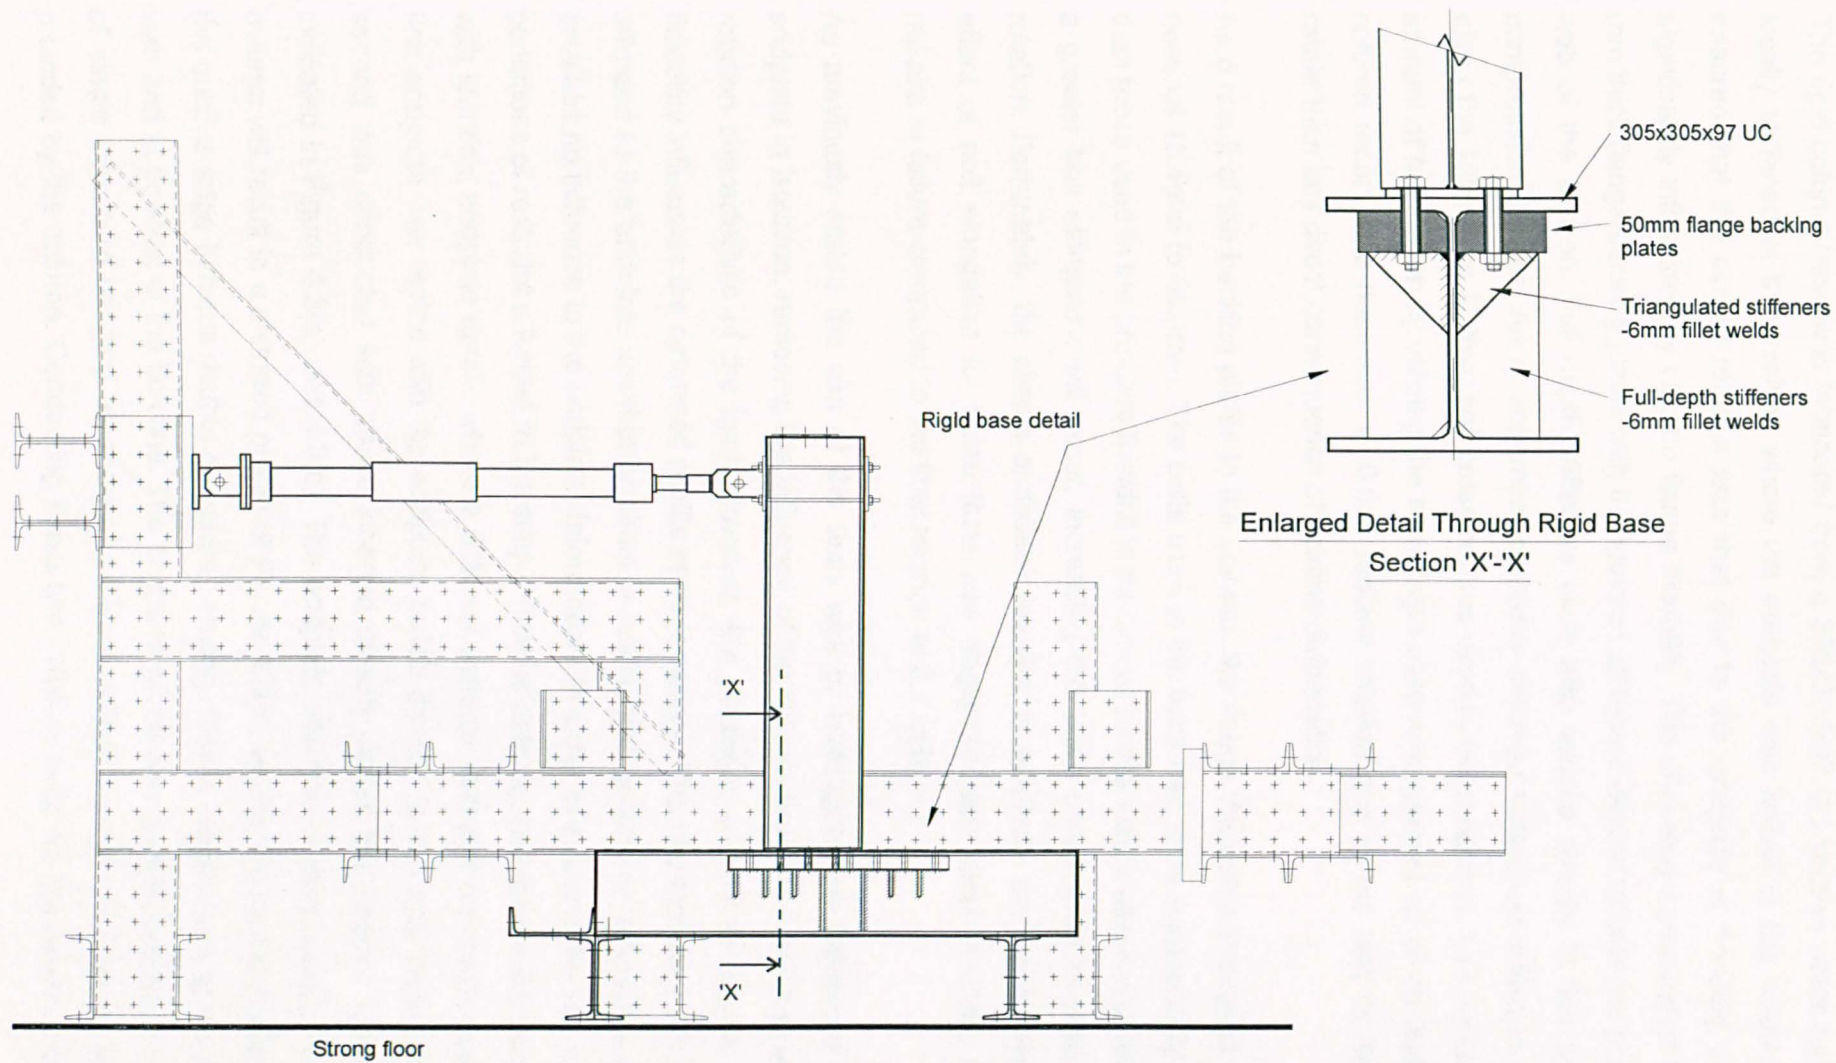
Details of test rig used for 'simple' isolated endplate tests
